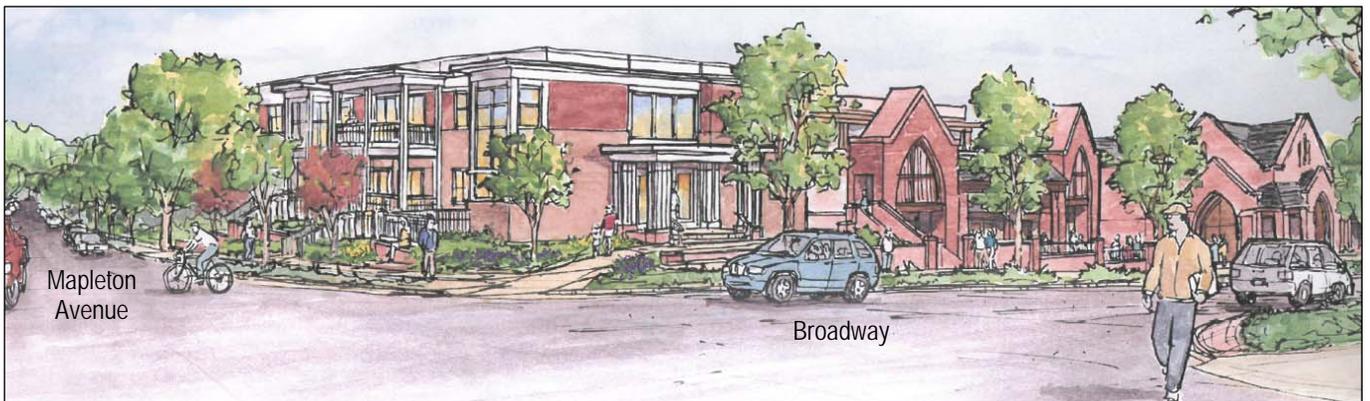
Perspective Sketch looking toward southeast at the proposed project
